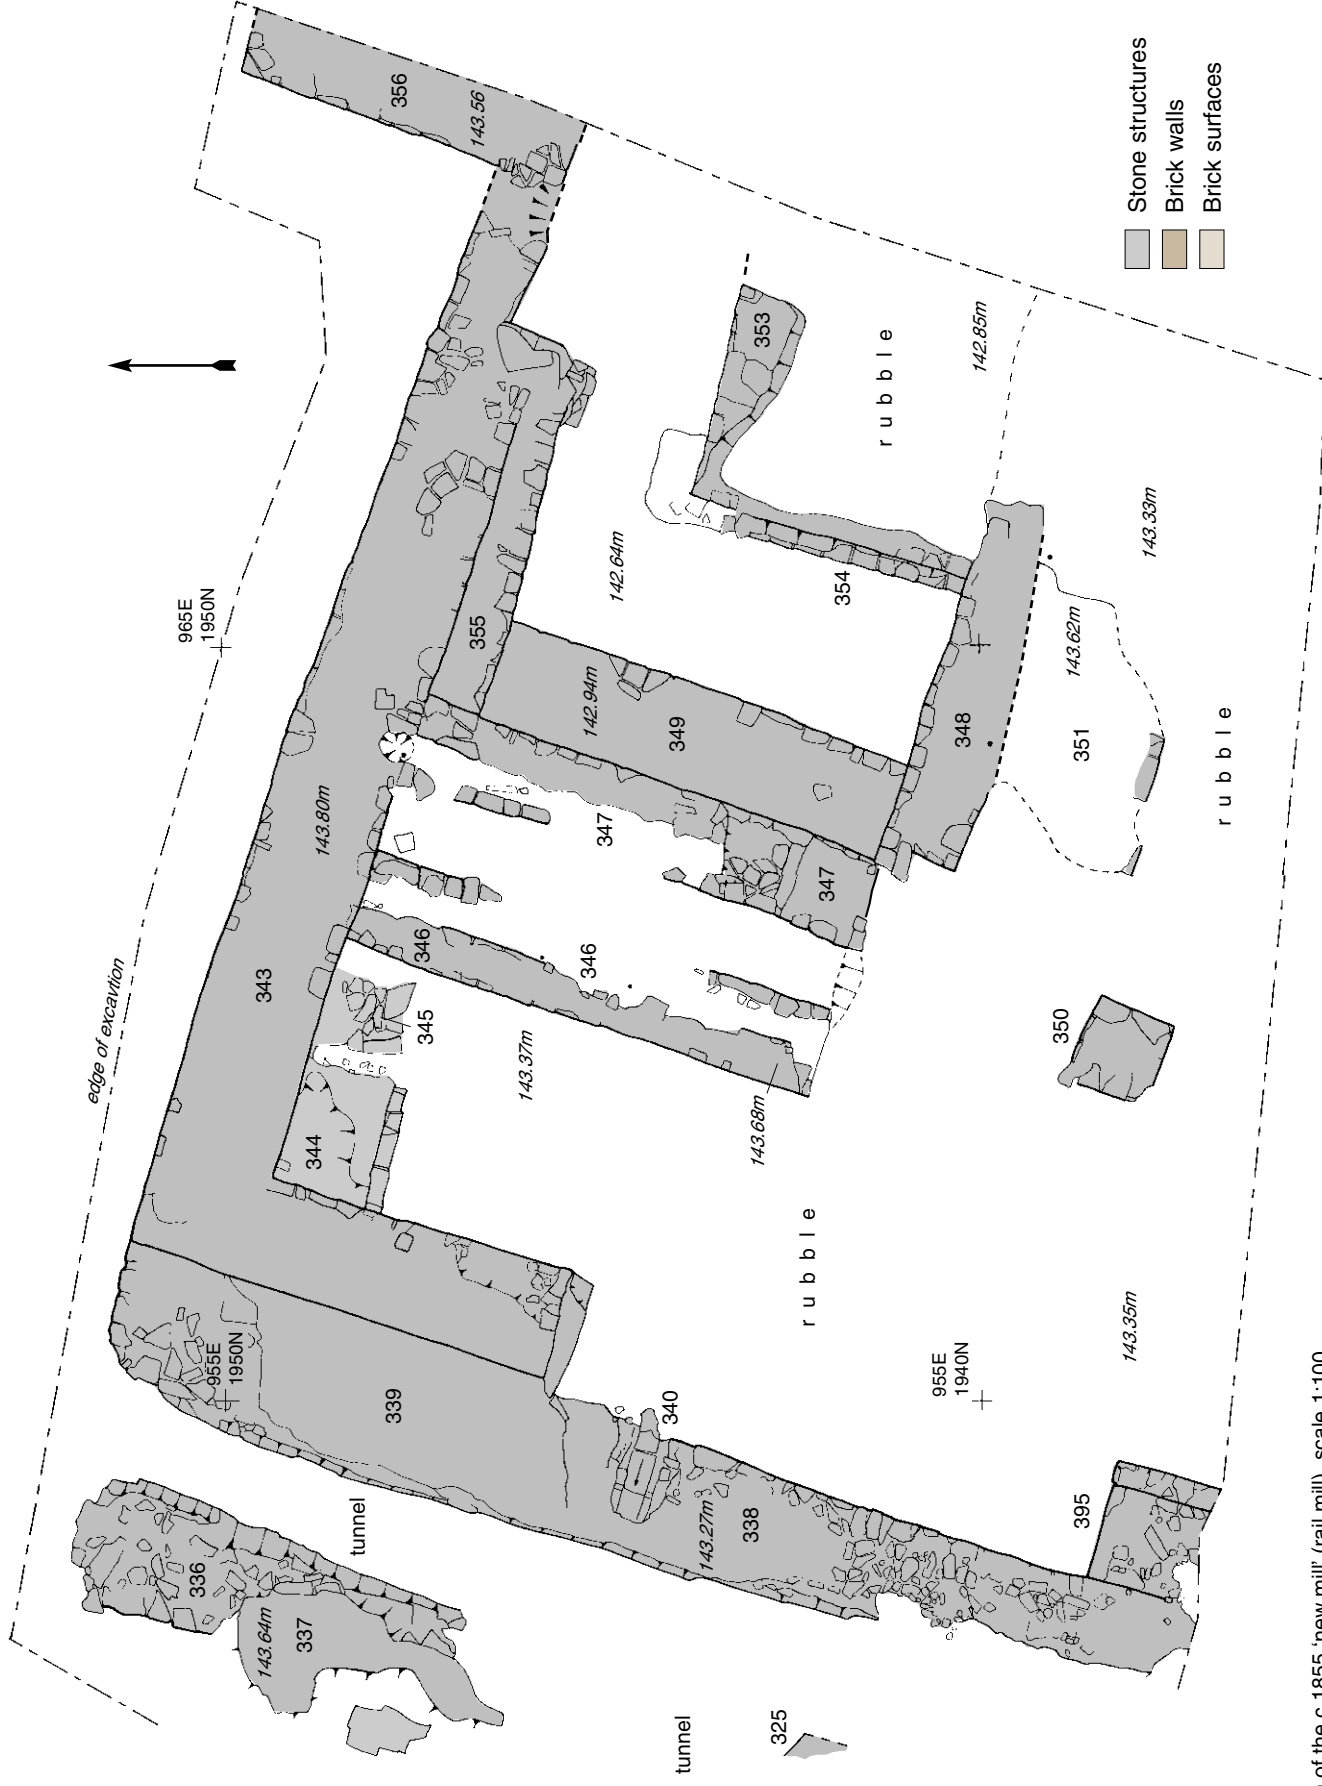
Plan of the c.1855 'new mill' (rail mill), scale 1:100
